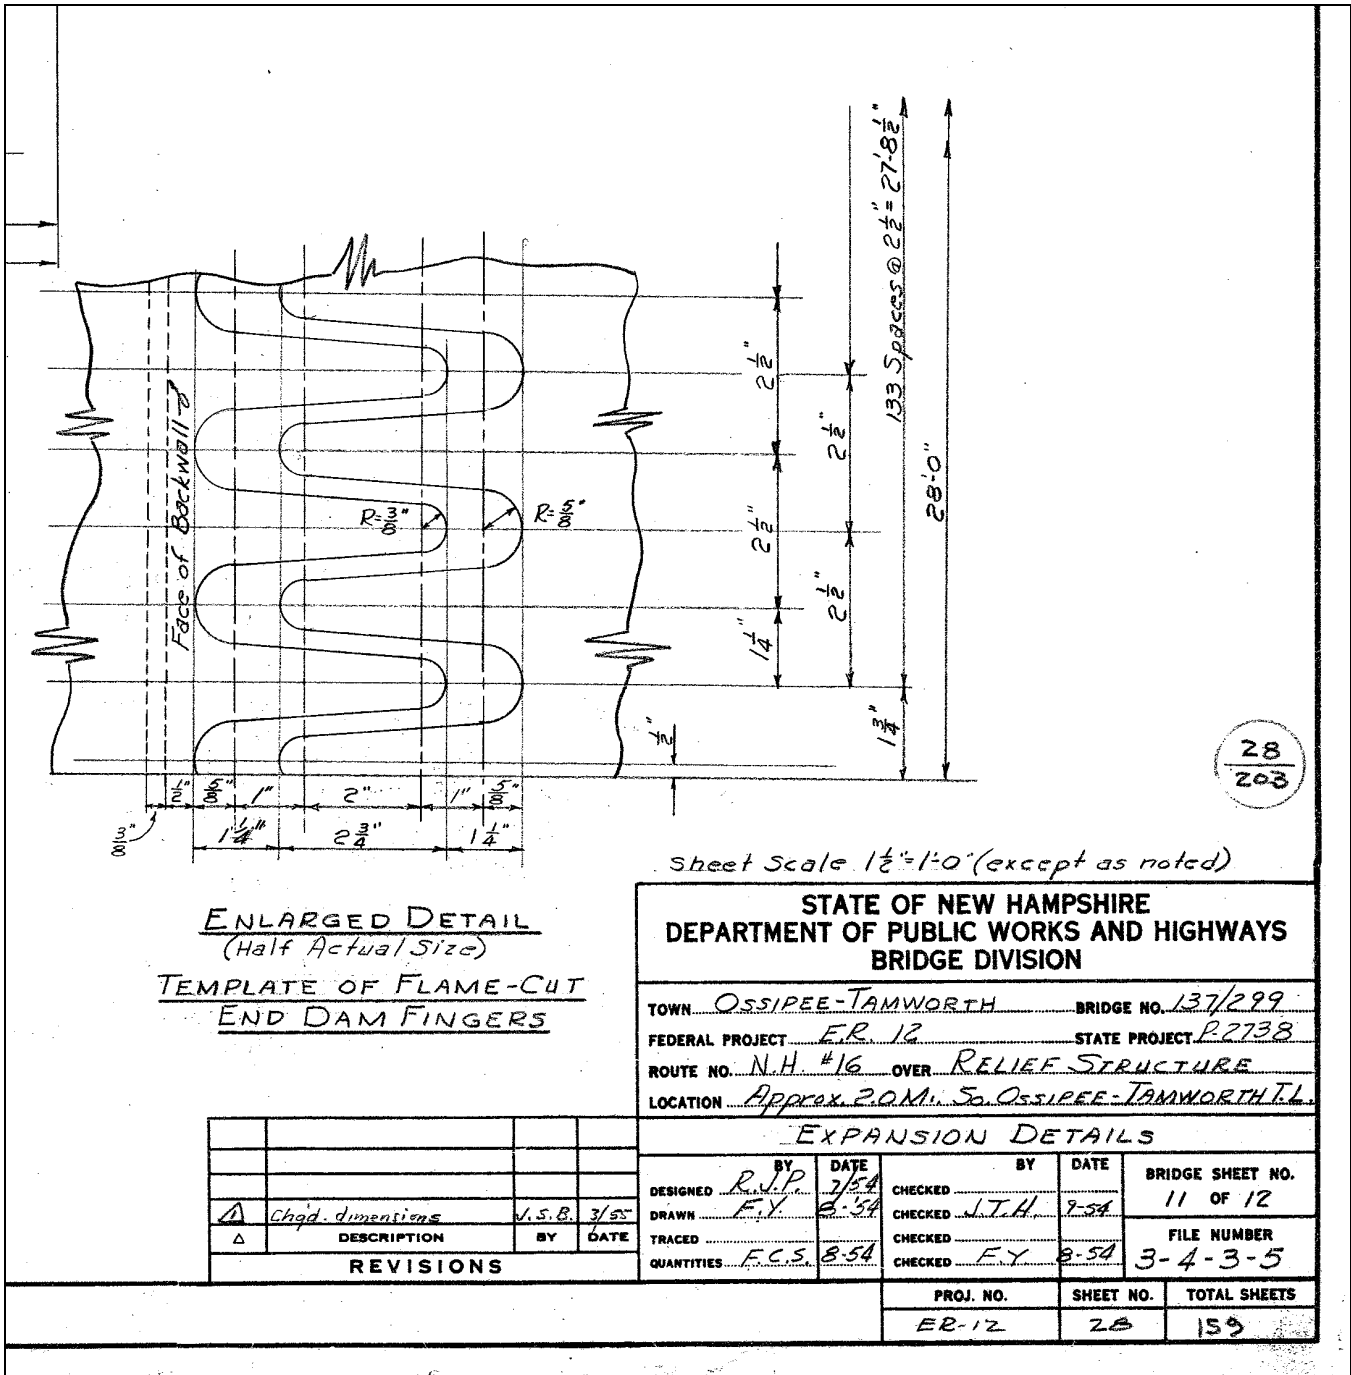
Deck expansion joint details showing custom finger-joints designed for bridge by R. J. Prowse. (From Sheet 11 of original drawings, NHDOT File No. 3-4-3-5).
